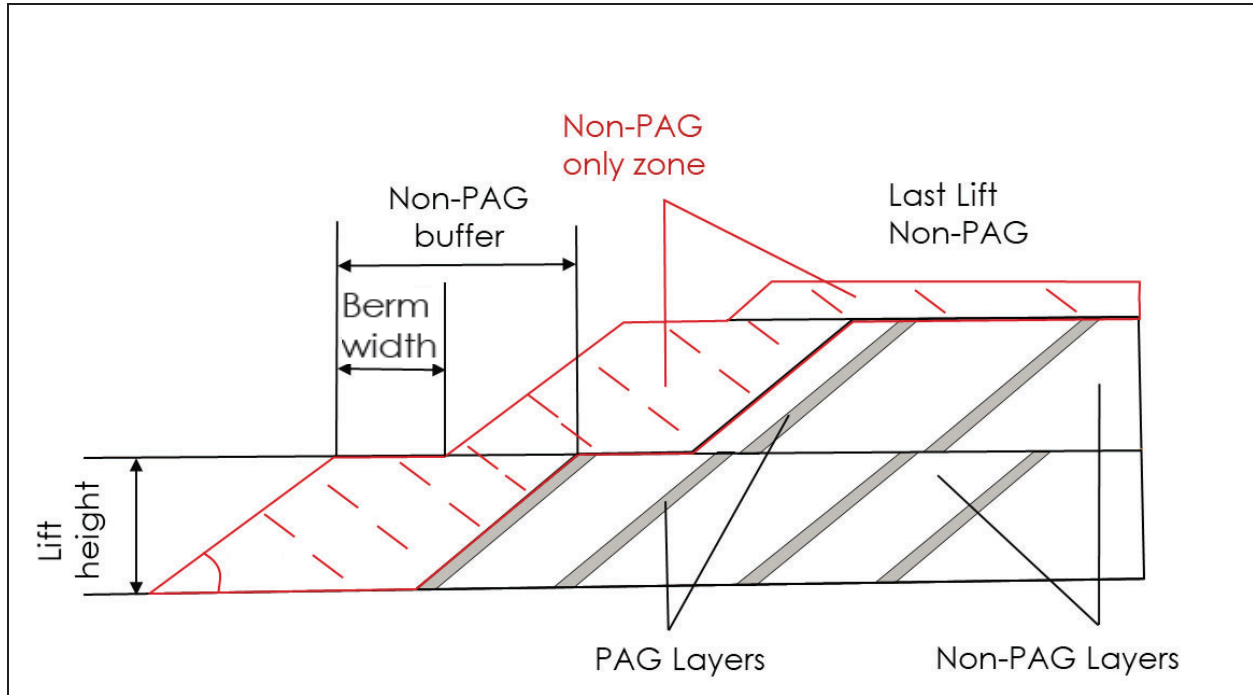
Conceptual Cross-Section of Waste Rock Pile
